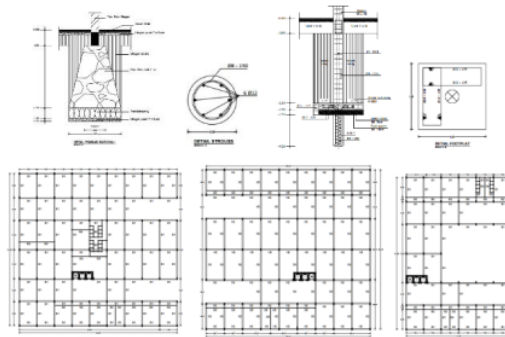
a. First Floor; b. Second Floor; c. Third Floor
